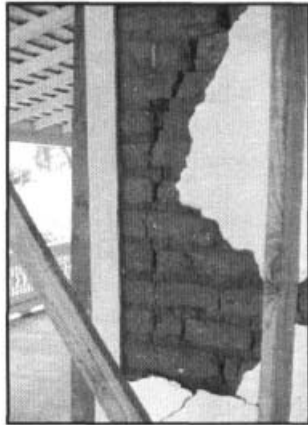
Vertical crack in the east face of the southeast corner of the second floor. The width of the crack is approximately 1 1/2 inches. A crack of this nature develops because of the tensile stresses in the adobe that develop as the south wall pulls away from the east wall.
